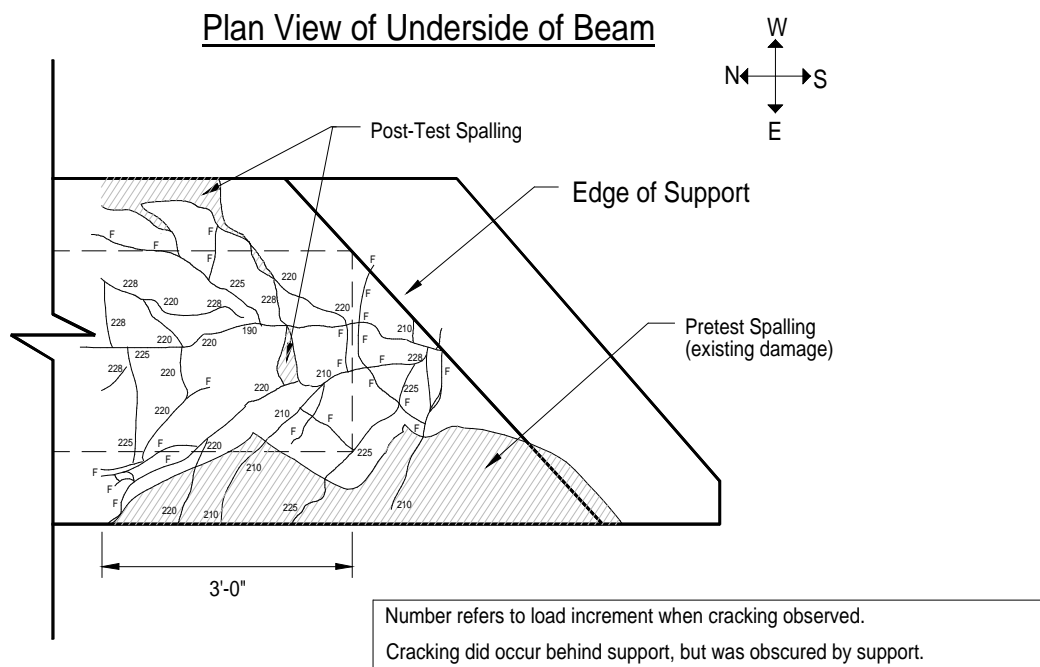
Crack Map of Beam Bottom Flange - Test 2
